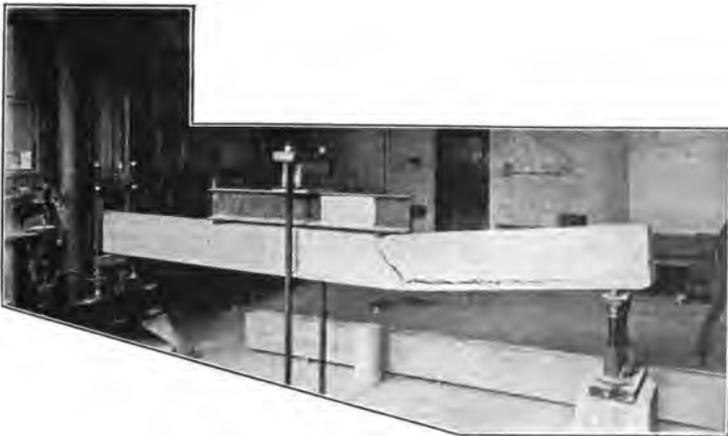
Failure of a Reinforced Concrete Beam.
